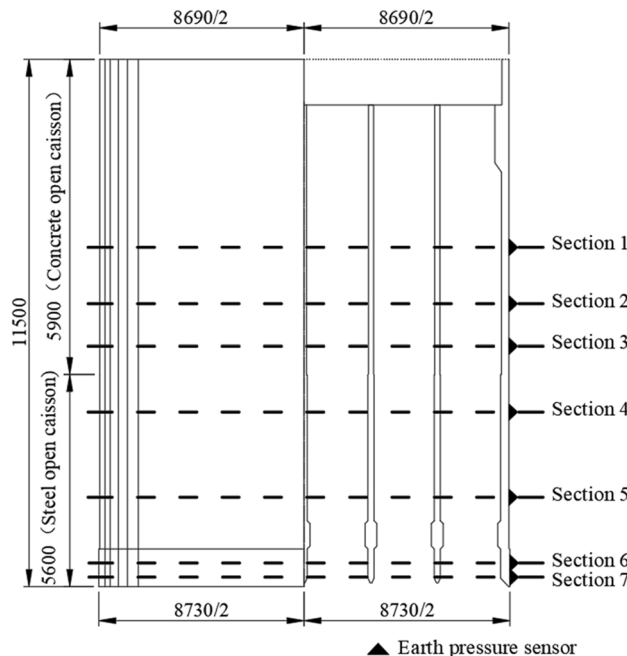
Monitoring sections of earth pressure sensor in sidewall (unit: cm).
